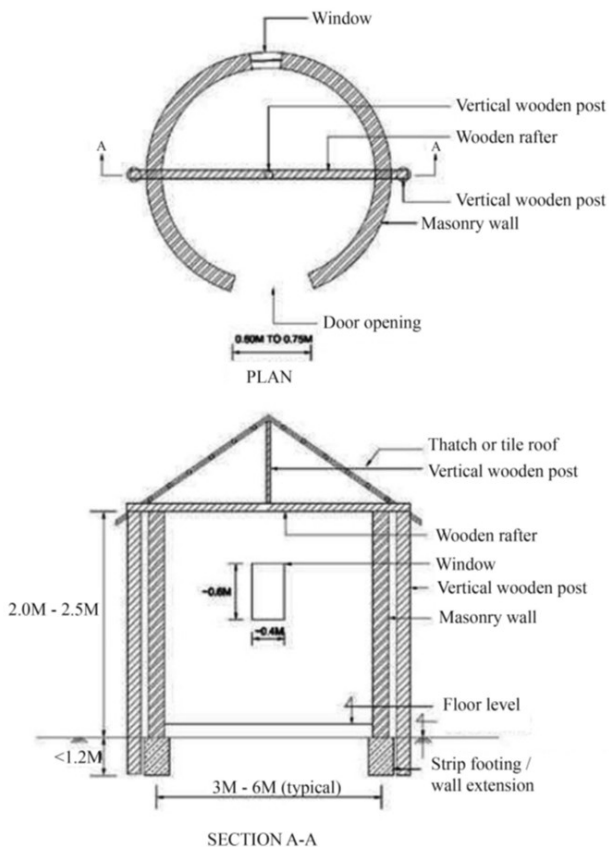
Plans and sections of Bhunga house (Source: aina.wikidot.com)
